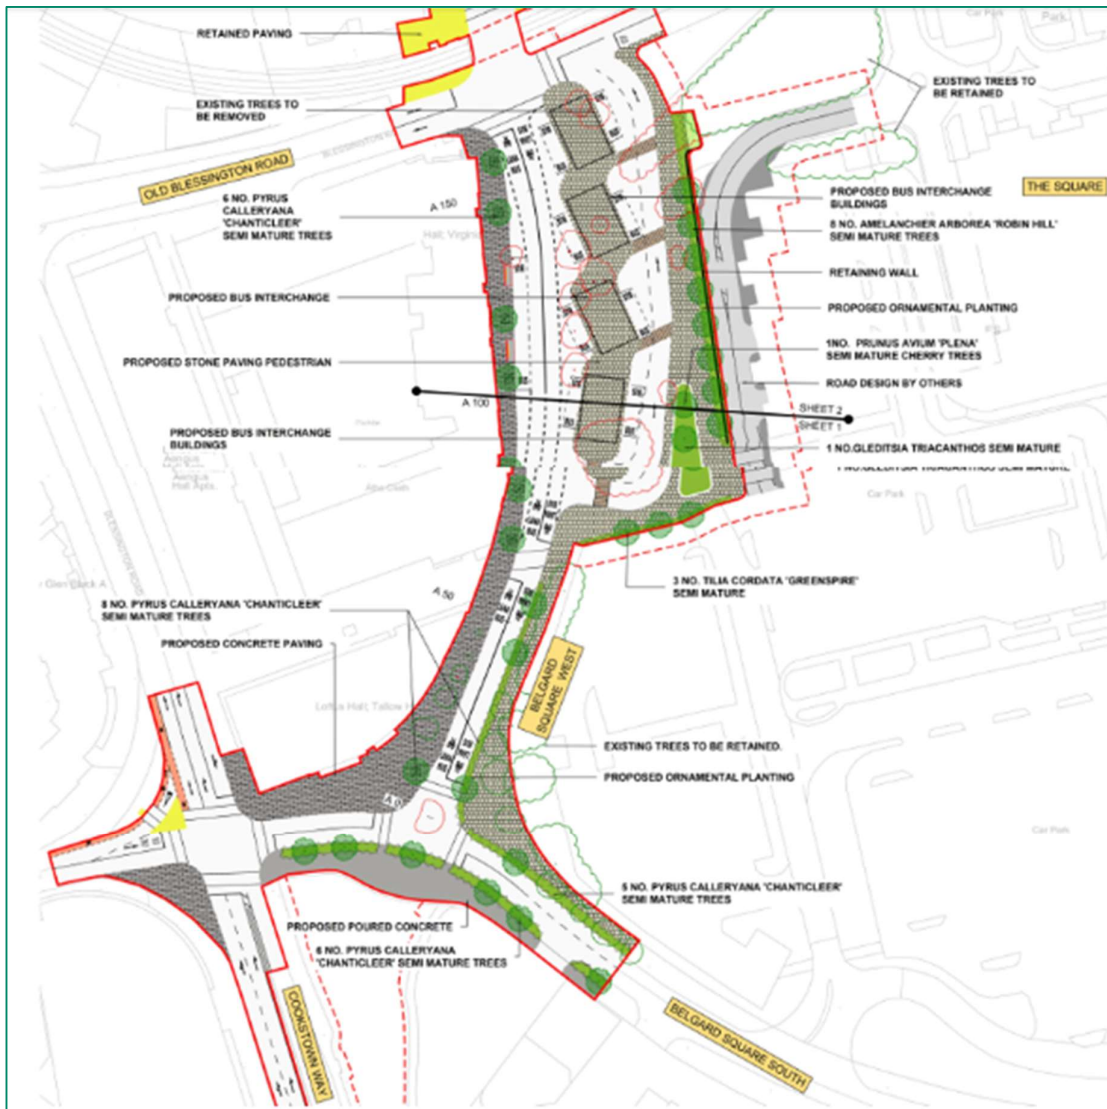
Extract of Landscape General Arrangement Drawings Belgard Square West (south of Old Blessington Road)
